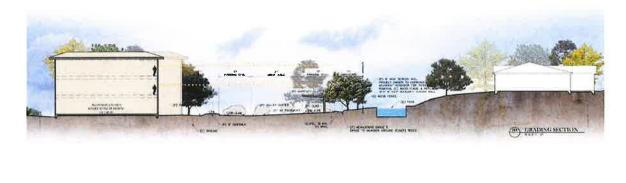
BUILDING SITE SECTION (CIMARRON HILLS-SOUTH)
